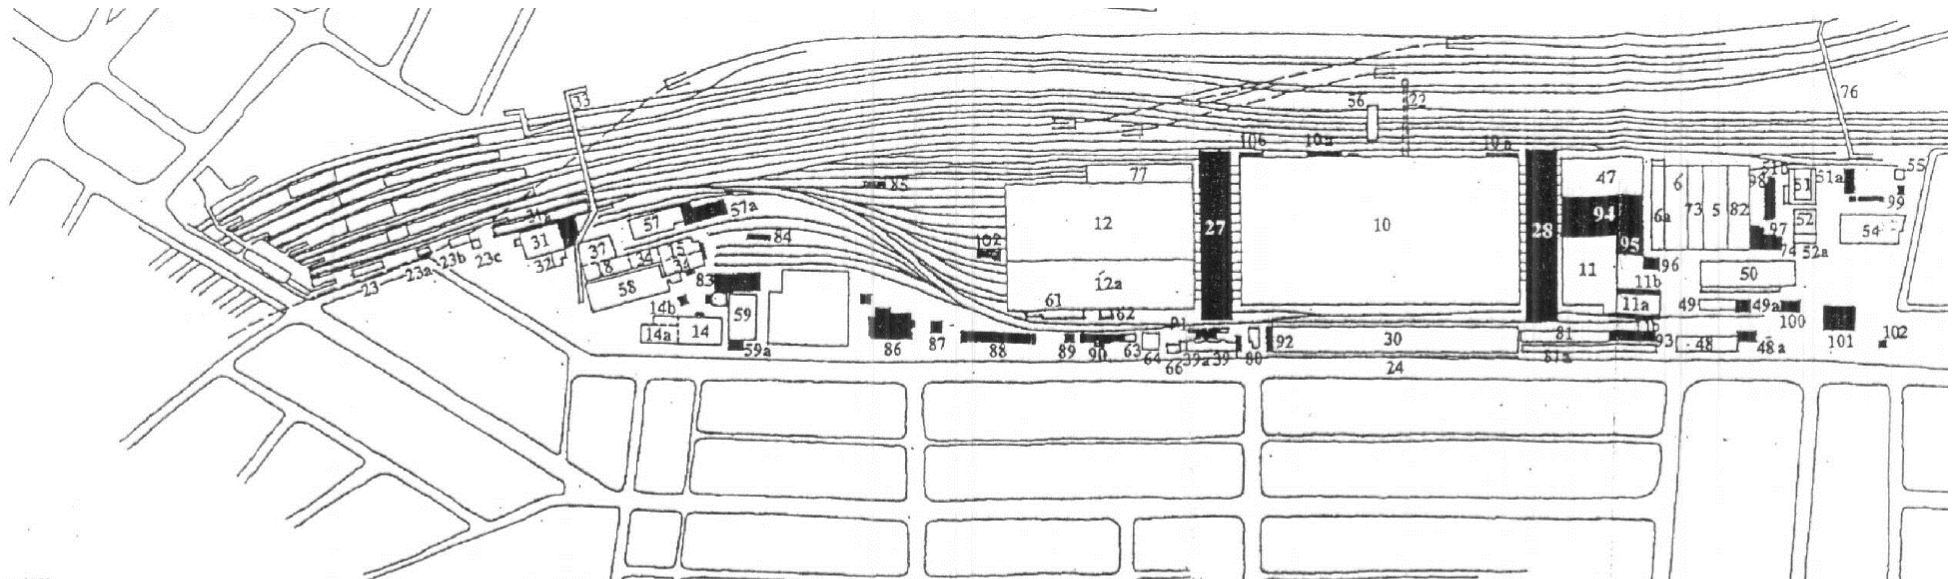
Buildings indicated on site in 1927 (Source: DPWS)
